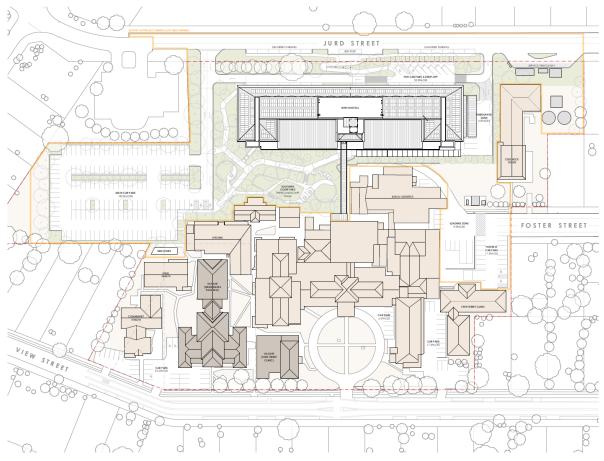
Site Plan - Fitzpatrick and Partners 2024
